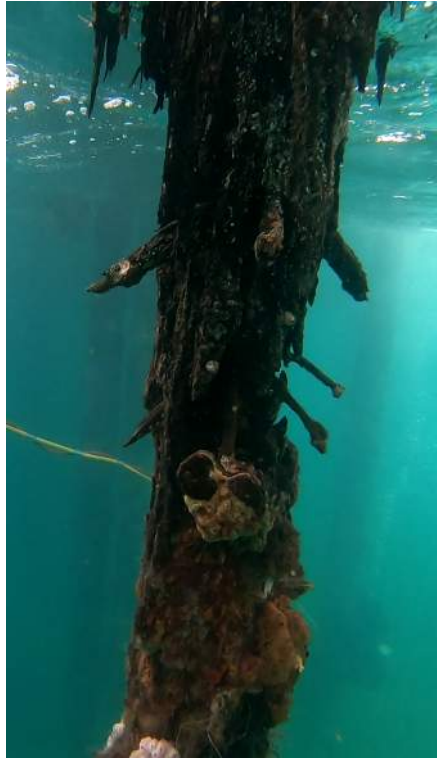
Typical Condition 7 Timber Pile (Defect: Necking & Splitting)
